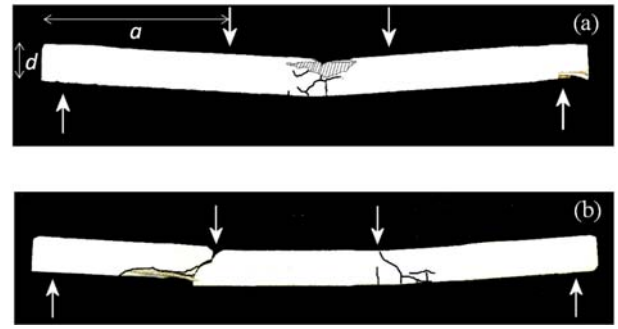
Damage to model RC beams in four-point bending tests ( $A_s/A_g = 0.85\%$ ): (a) bending failure, beam with shear reinforcement; (b) flexural shear failure, beam without shear reinforcement.
